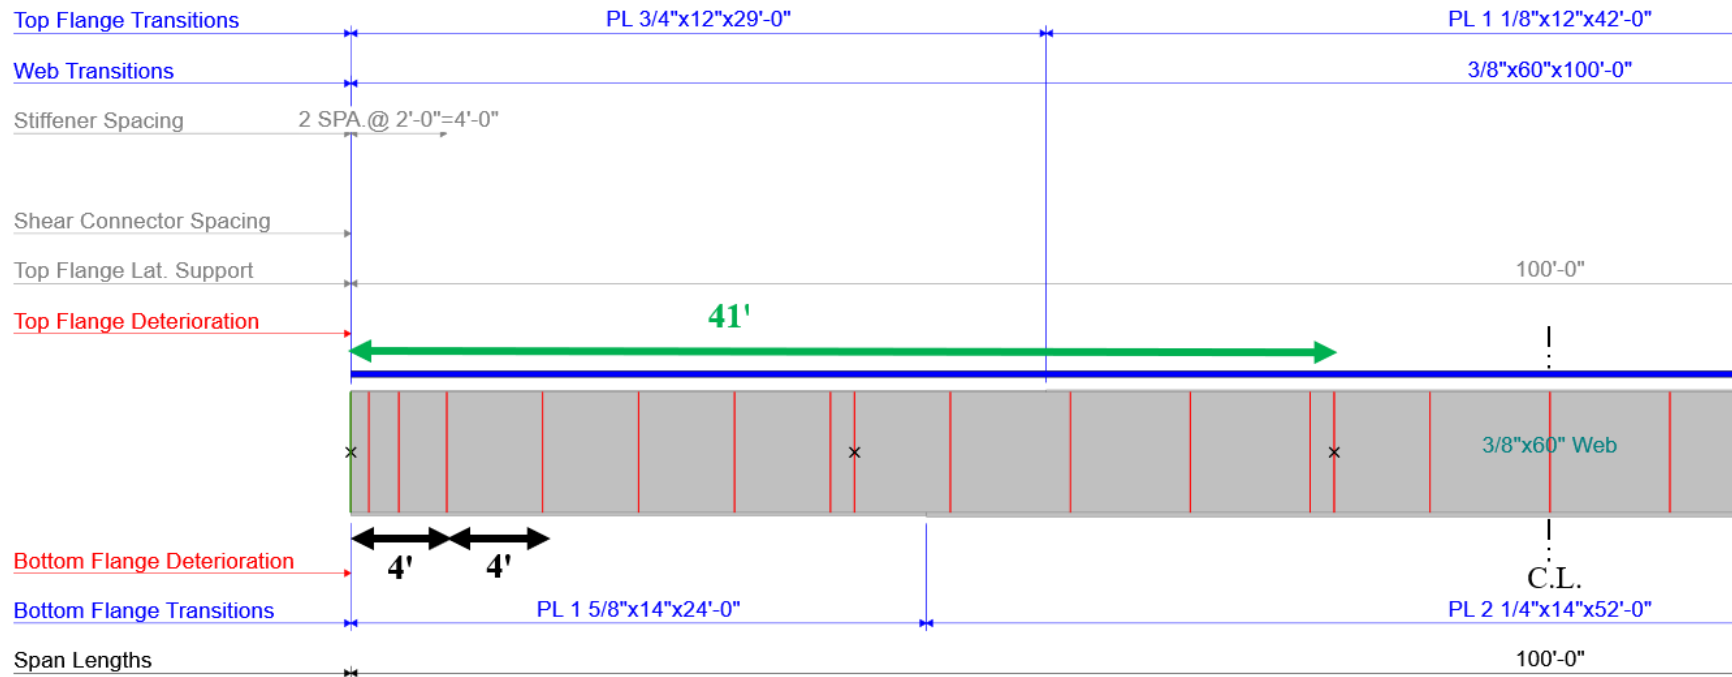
Bridge Girder Details for S080 00526 (AASHTOWare™ BrR, 2023)
